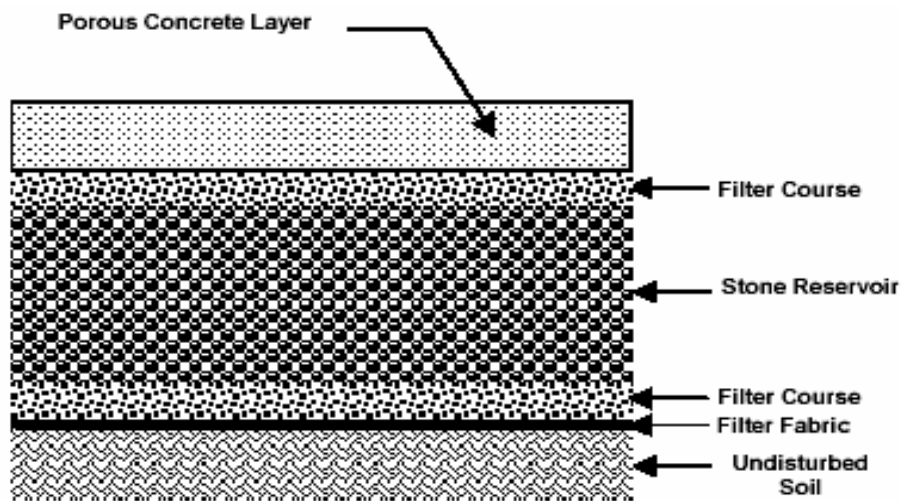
Porous concrete system section (modified from: LAC 2000) (Georgia Stormwater Management Manual, 2006).
